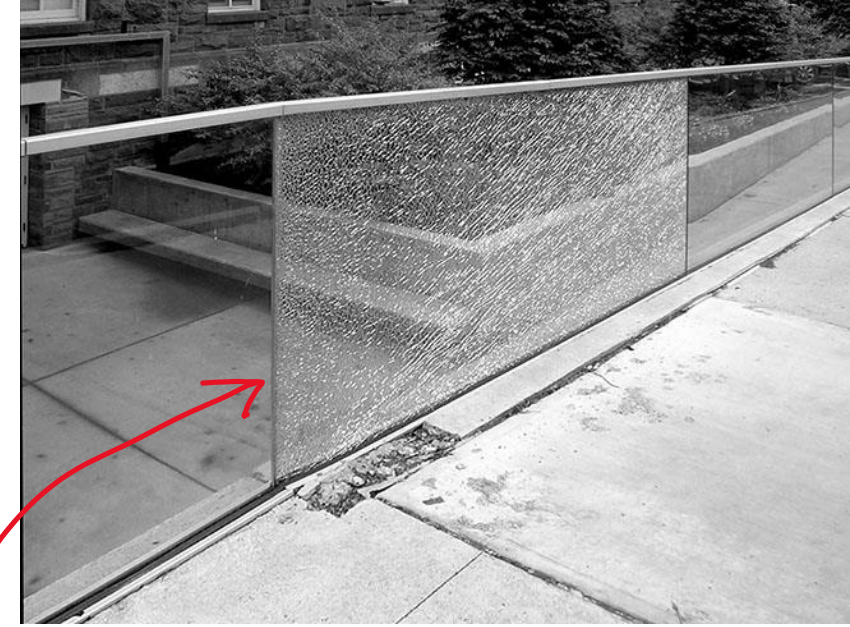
A glass guard separating Milstein Hall's loading area from an accessible ramp shattered in 2015.
